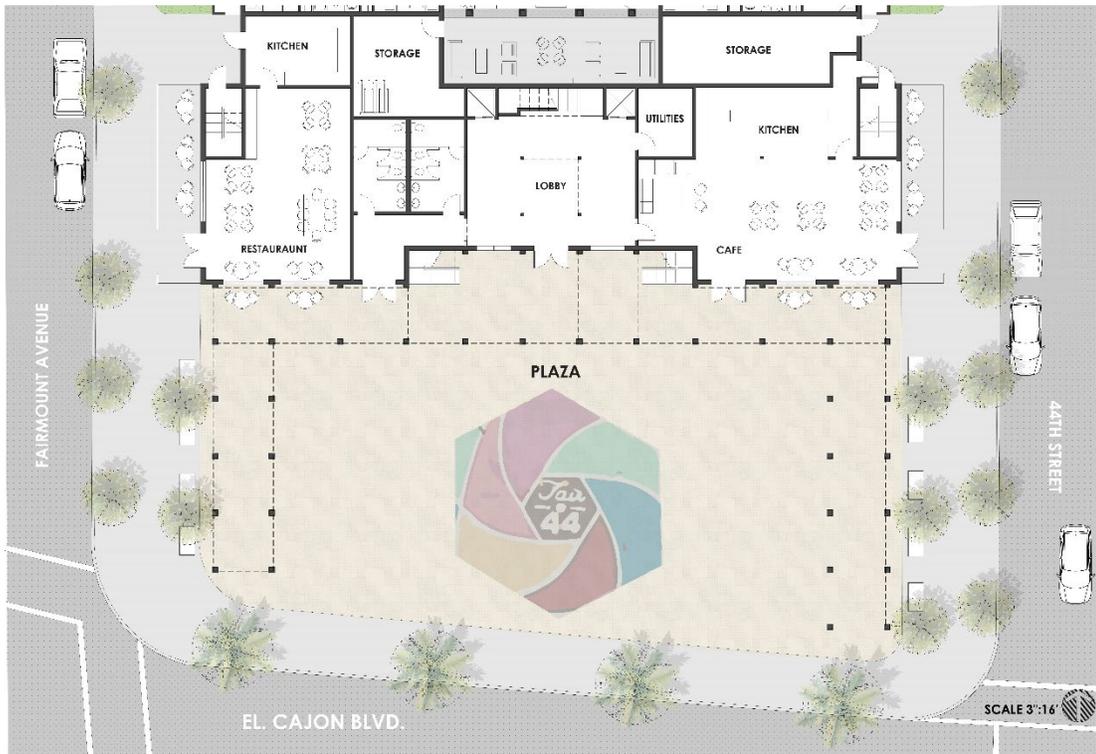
Cultural Center Ground Floor Plan (Source: Author)
